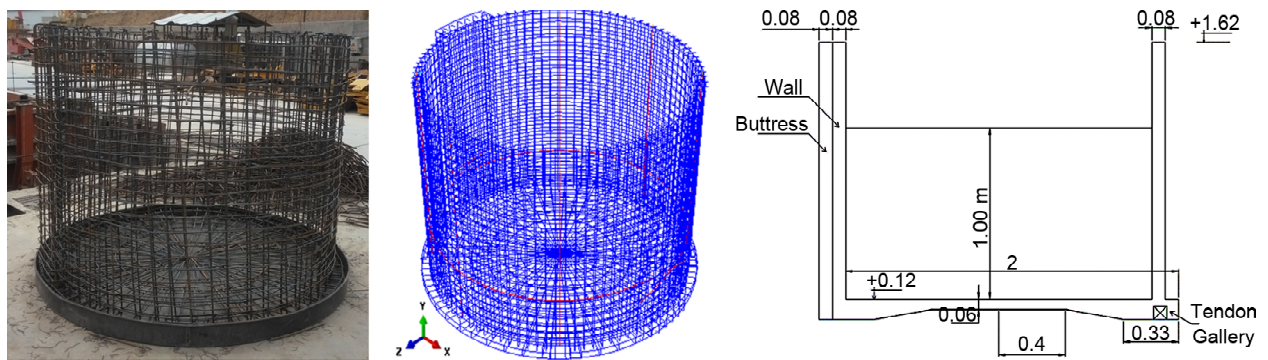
Geometric and Reinforcement details of the Prestressed Tank.
